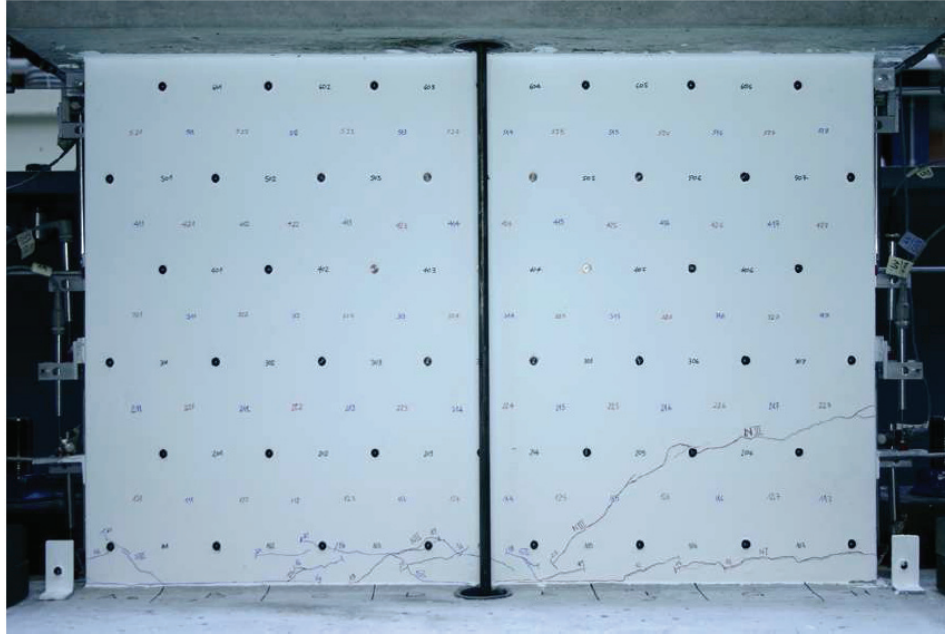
Initial flexural cracks on wall M4 tested by Greifenhagen et al. (2005)
